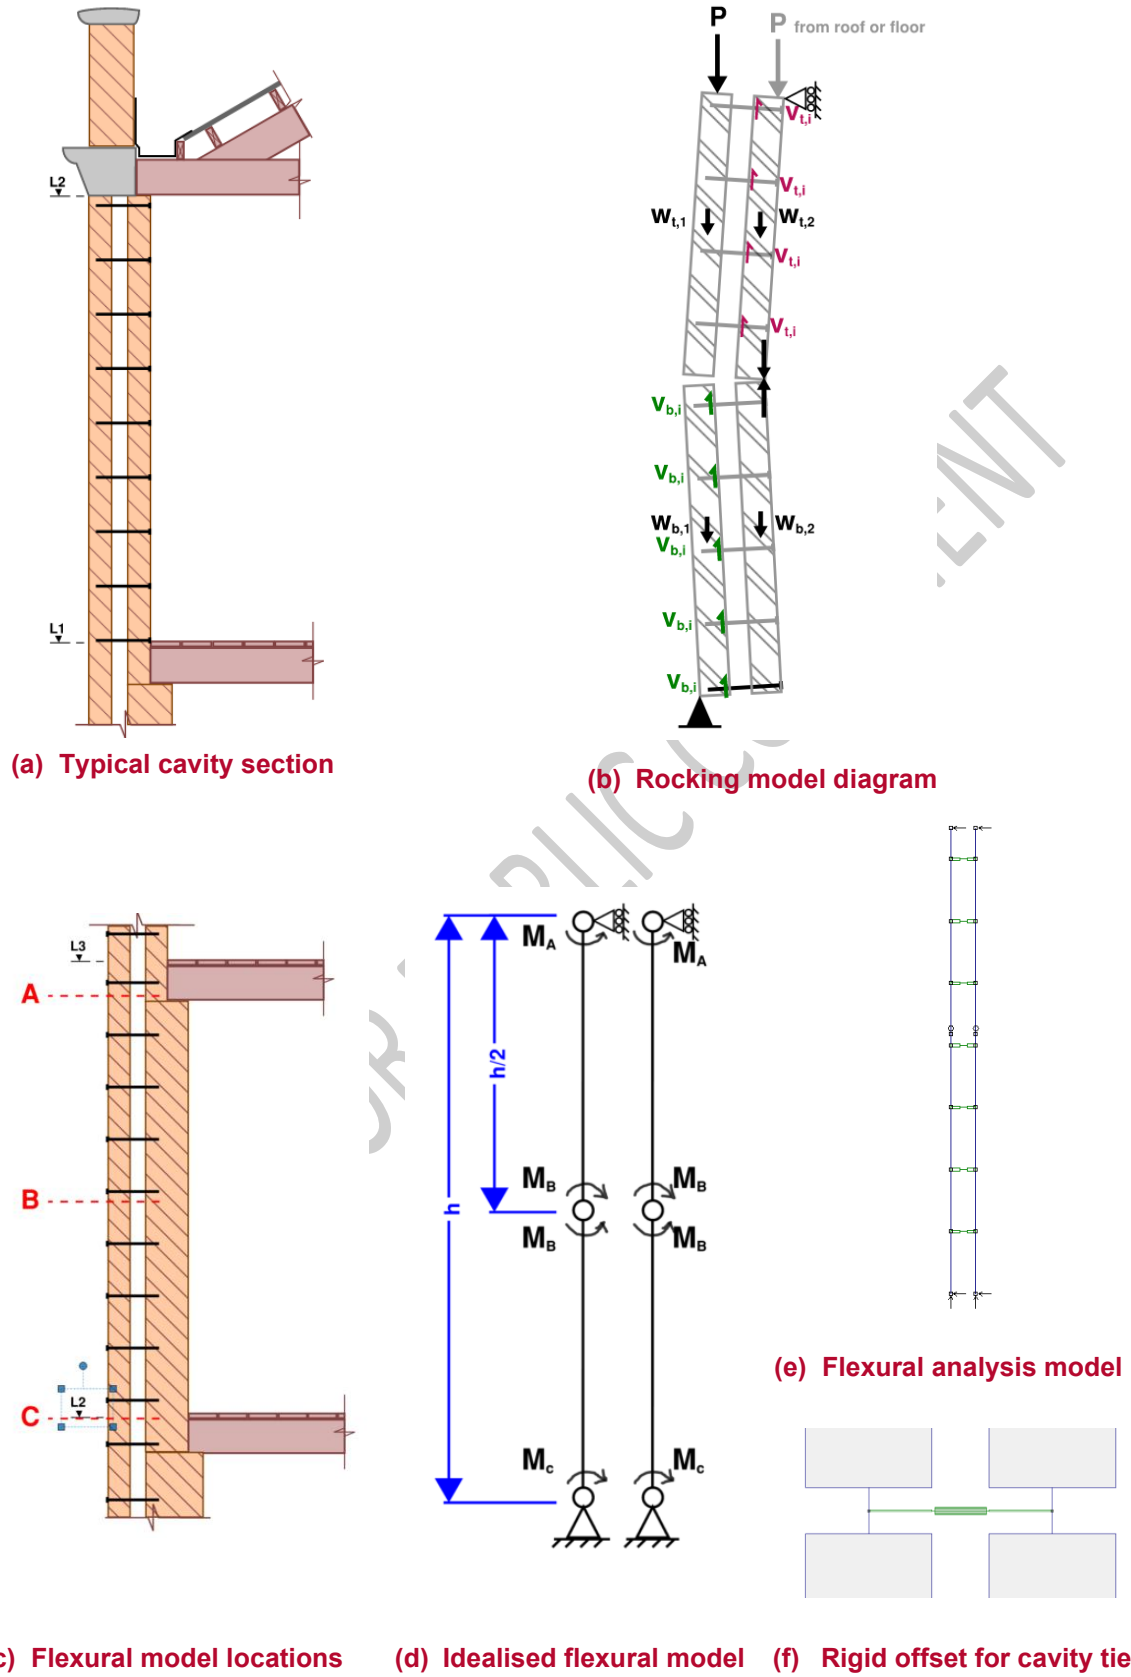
B.15: Rocking cavity wall model and Flexural cavity wall model
